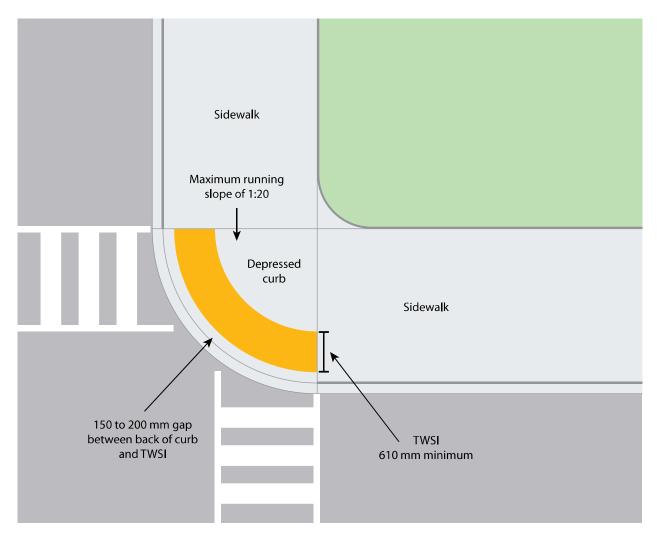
Design and TWSI Placement for a Depressed Curb at an Intersection Crossing
